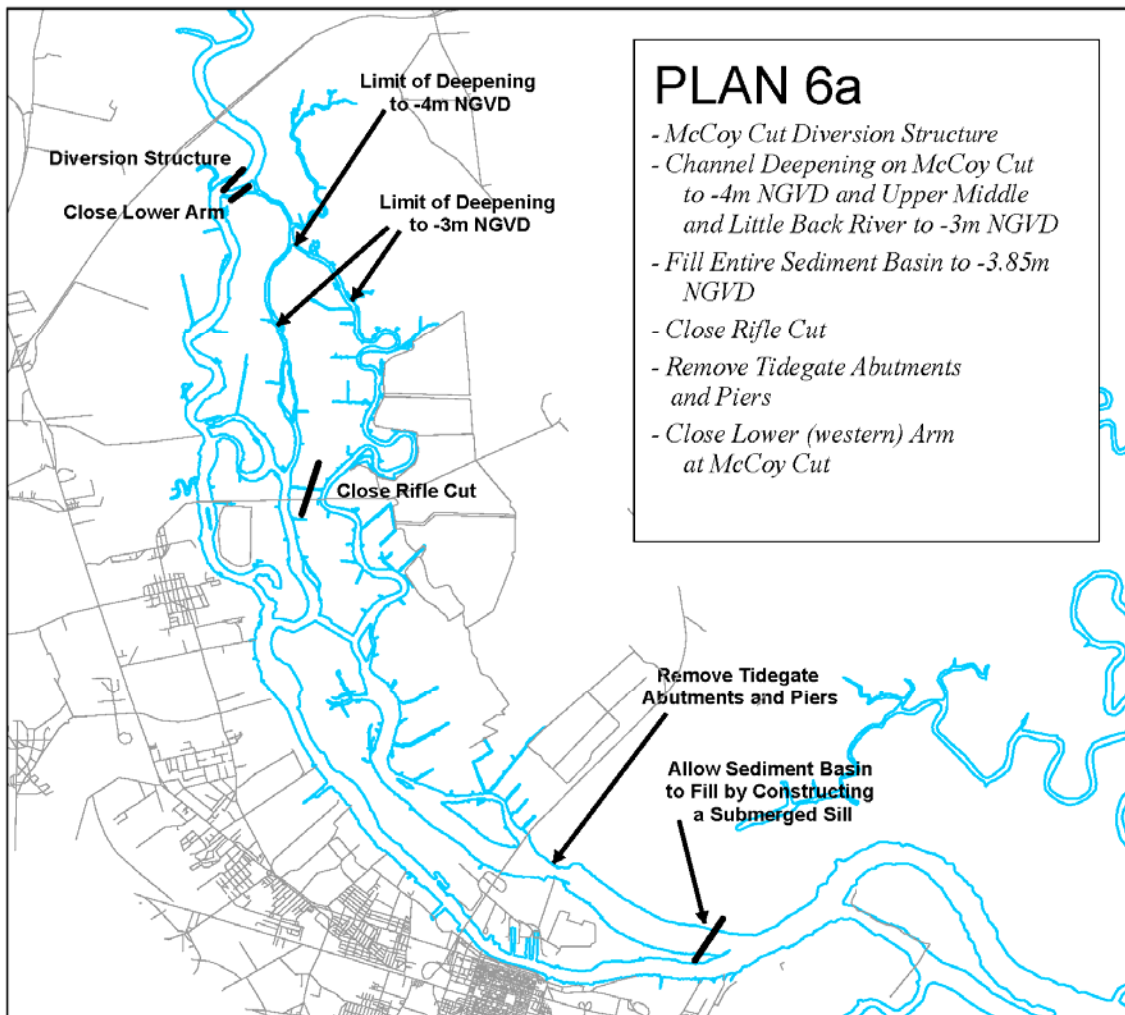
Mitigation Plan 6A (courtesy of the USACE Savannah District)
